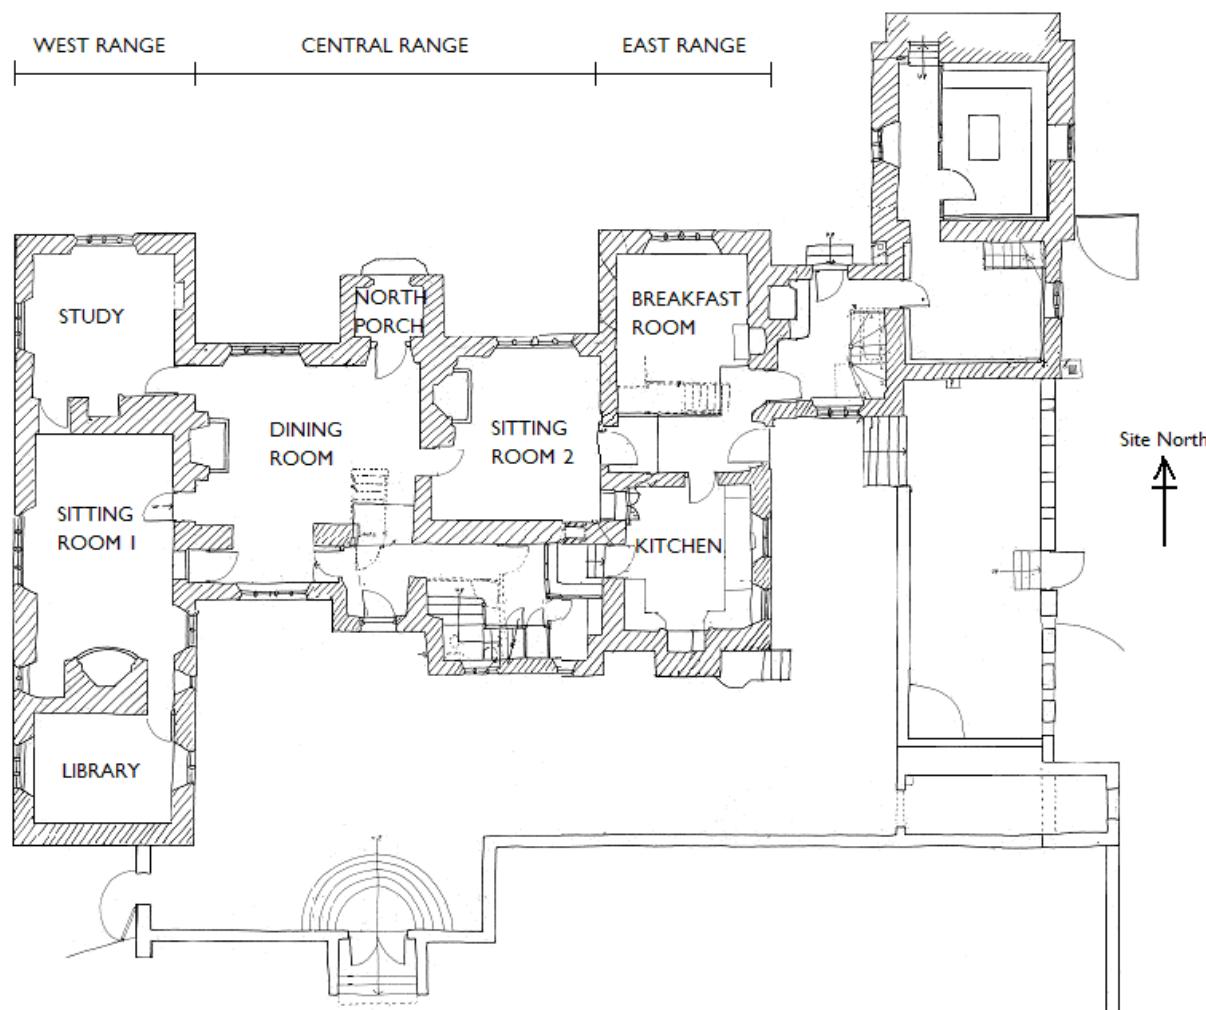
Ground-floor plan, provided by Andrew Wood Architect
